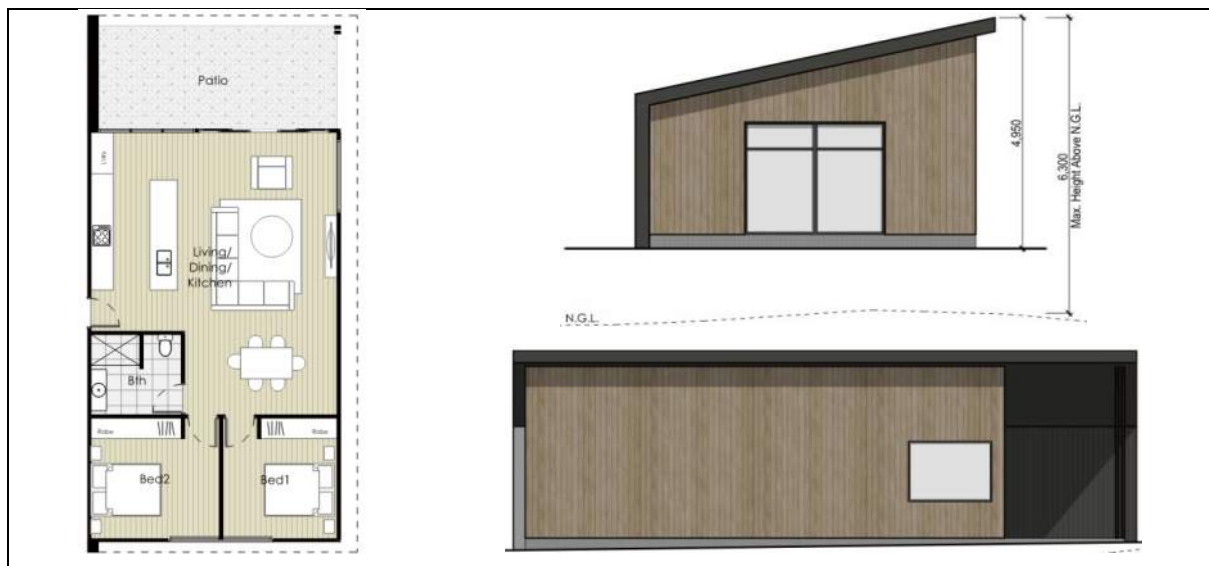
Floor Plan (left), Elevations - North/East (right) – Building 1B. Source: Coactive Building Design
